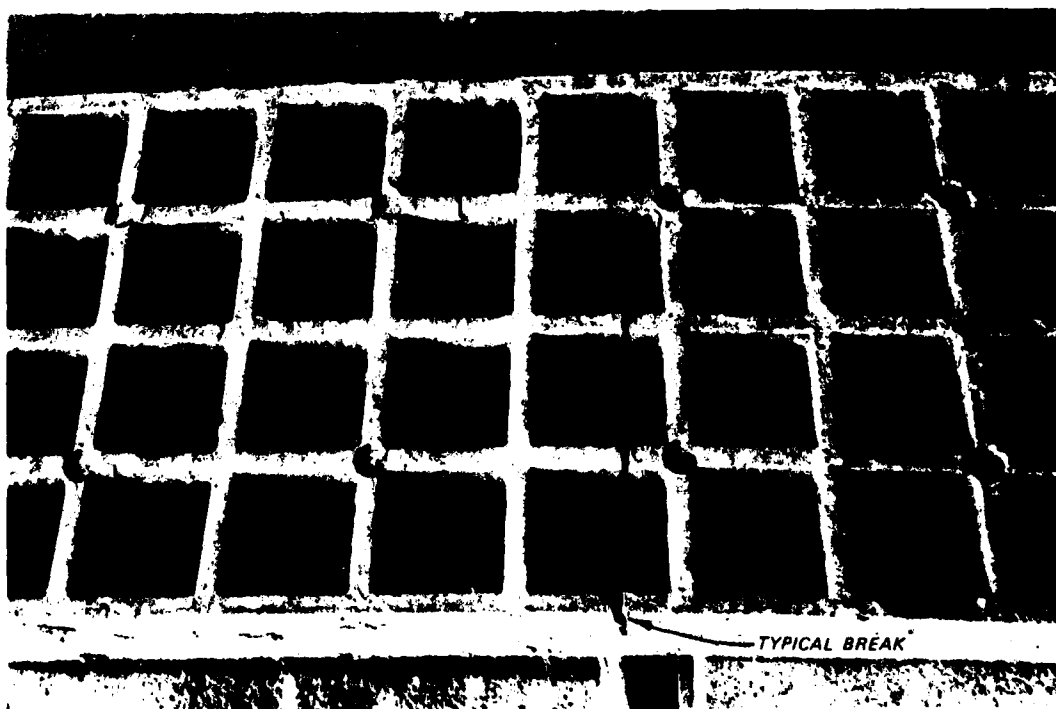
Close-up of a typical break in the bottom of a Sod Saver Block at failure
